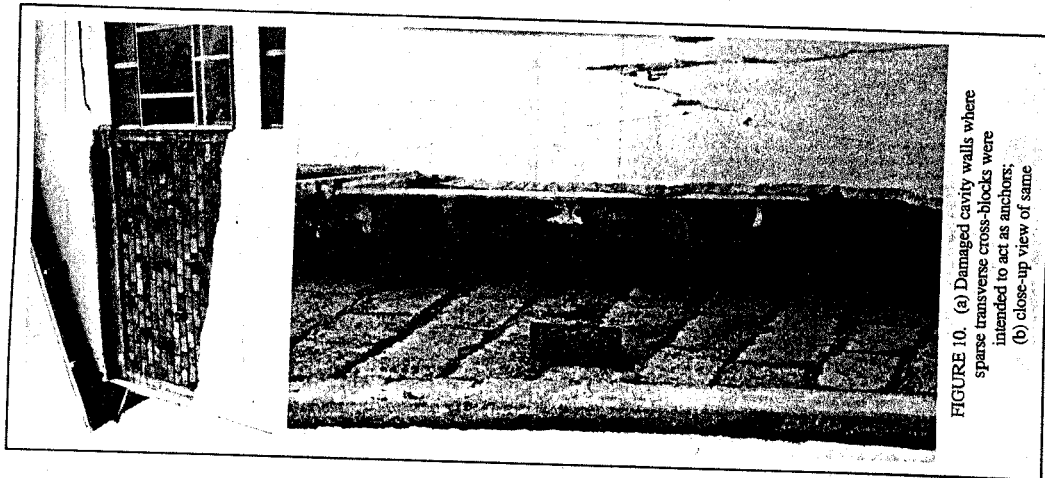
(a) Damaged cavity walls where sparse transverse cross-blocks were intended to act as anchors. (b) close-up view of same
